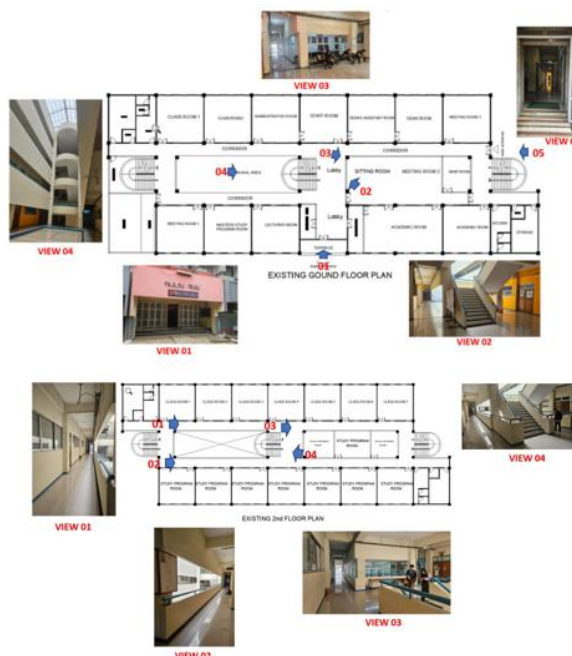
Ground and Second Floor Plans of the Faculty of Engineering Building, Universitas Krisnadwipayana
